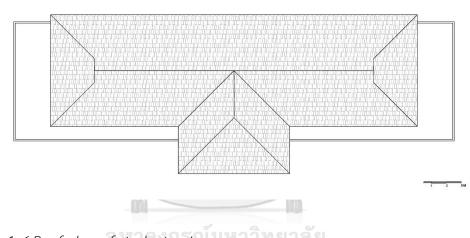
6.Roof plan of student union (Drawn by author referenced from old photographs and site plan)
